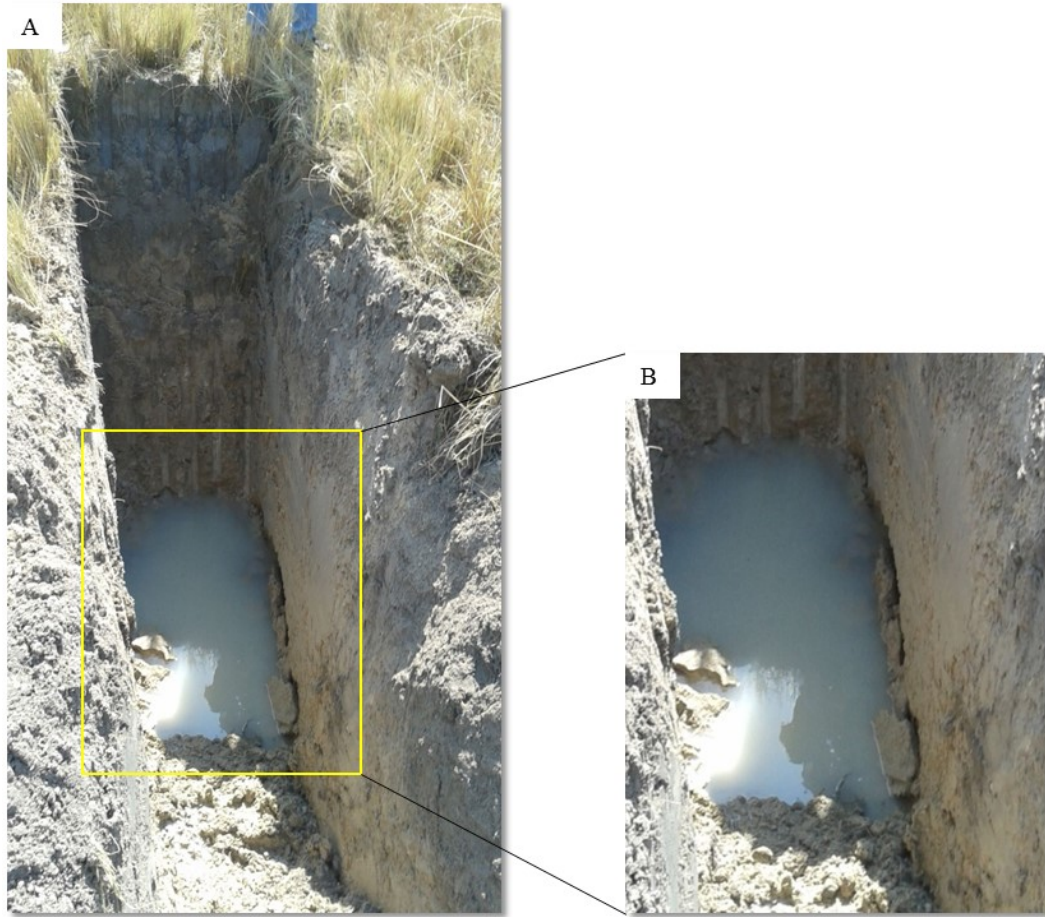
Test Pit 4 showing water that seeped into the pit in A and the collapsing sidewall in B.
